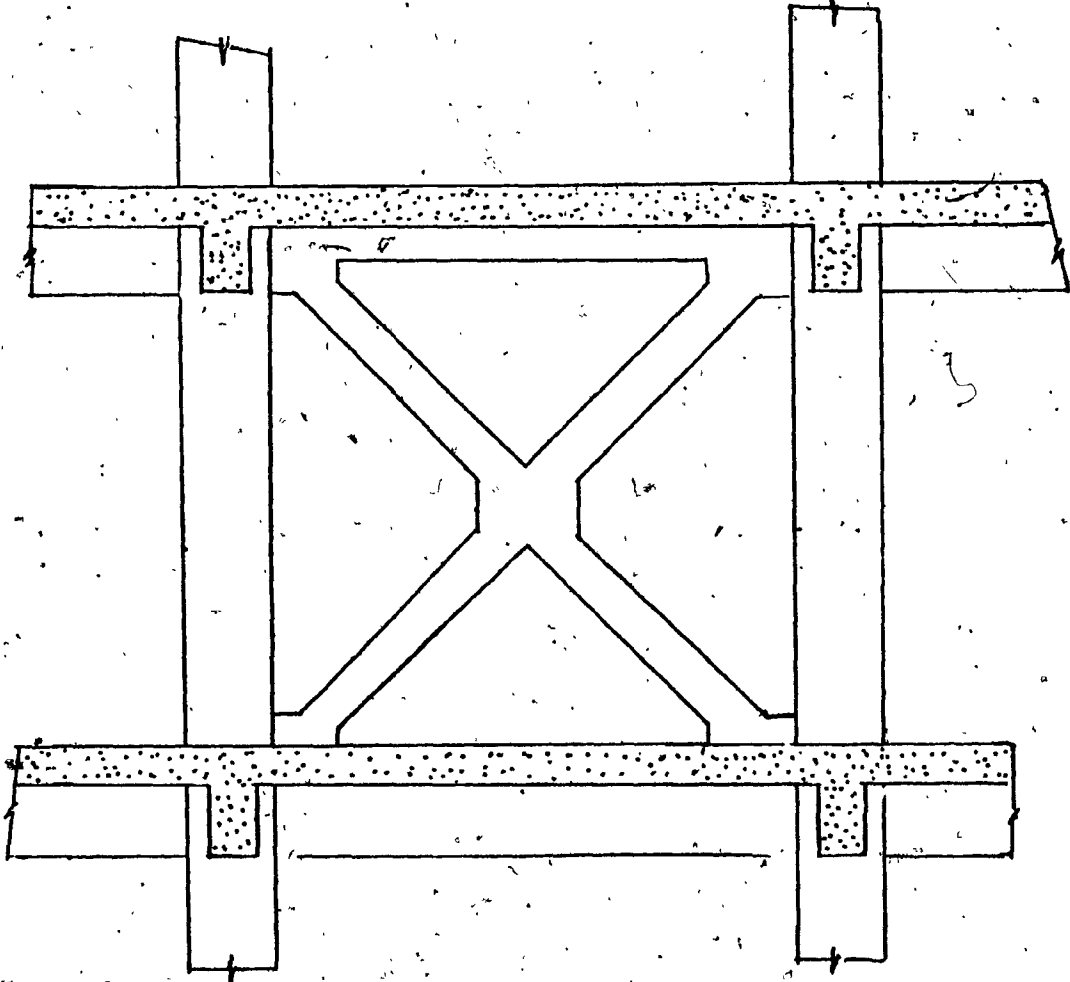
Frame With Reinforced Concrete Diagonal Bracings
